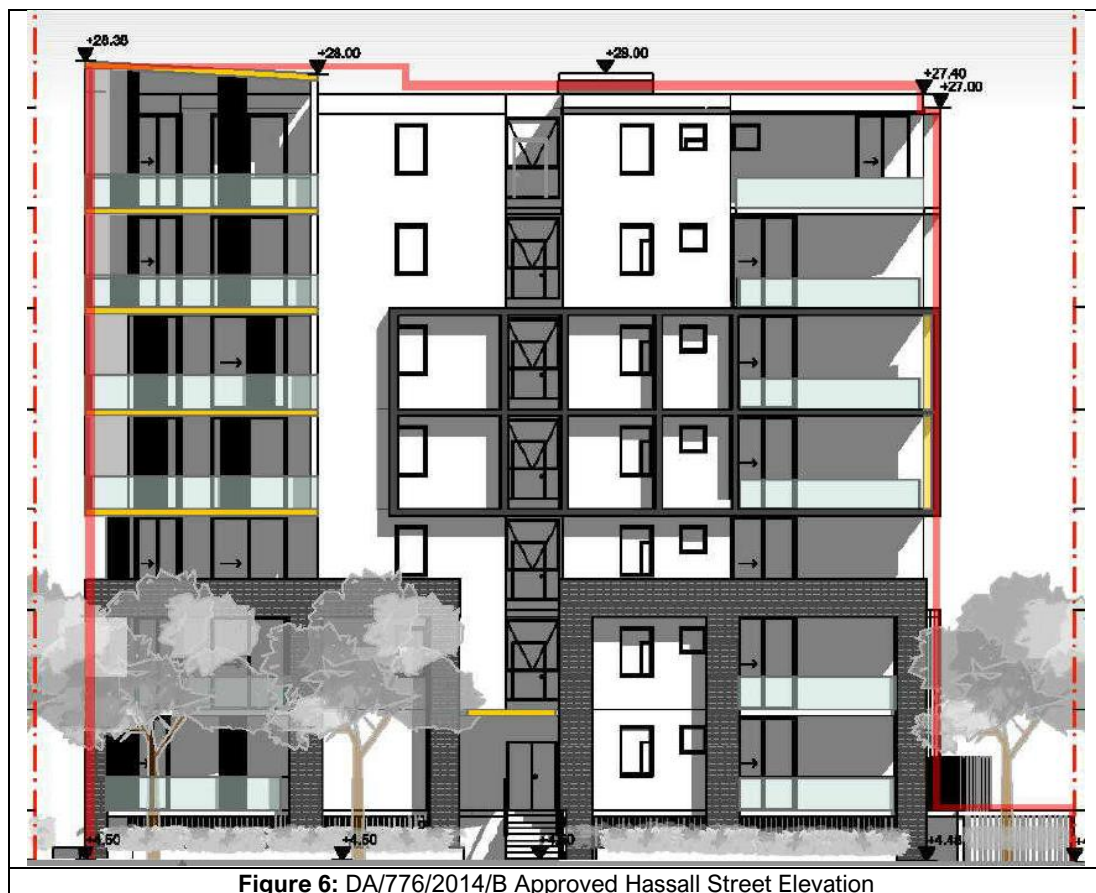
DA/776/2014/B Approved Hassall Street Elevation
